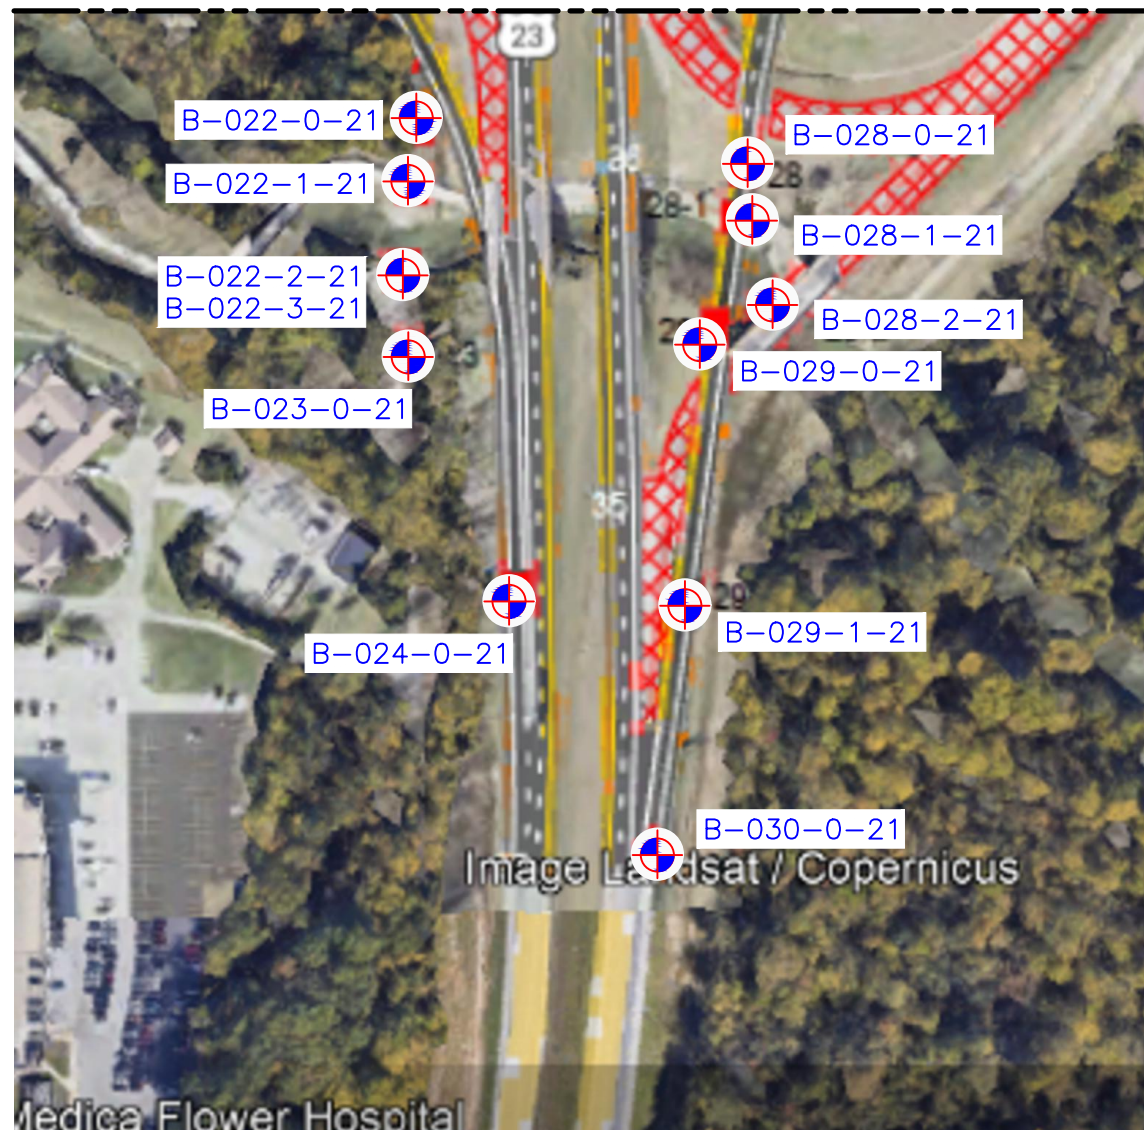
TEST BORING LOCATION PLAN — EAST PROPOSED INTERSECTION IMPROVEMENTS LUC-023-11.75, PID 105889 SYLVANIA, LUCAS COUNTY, OHIO
